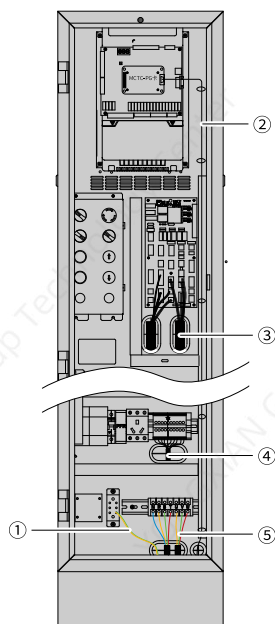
Wiring of external interfaces in the MRL control cabinet
